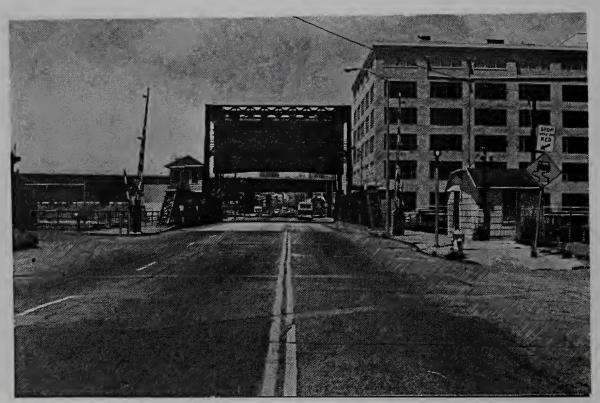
Fourth Street Bridge looking north along Fourth Street from Channel Street intersection
